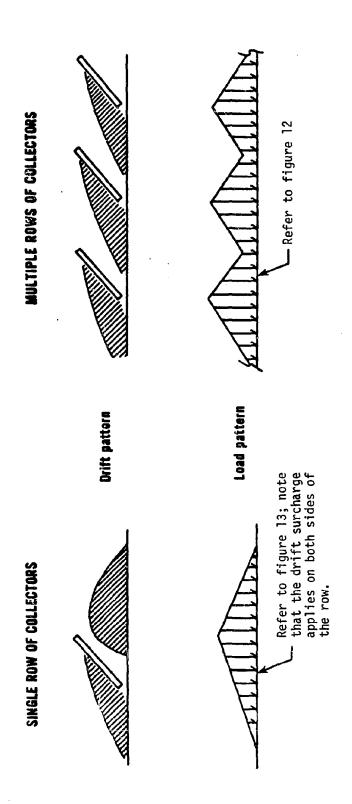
Load Patterns for Protruding Collectors Close to the Roof
